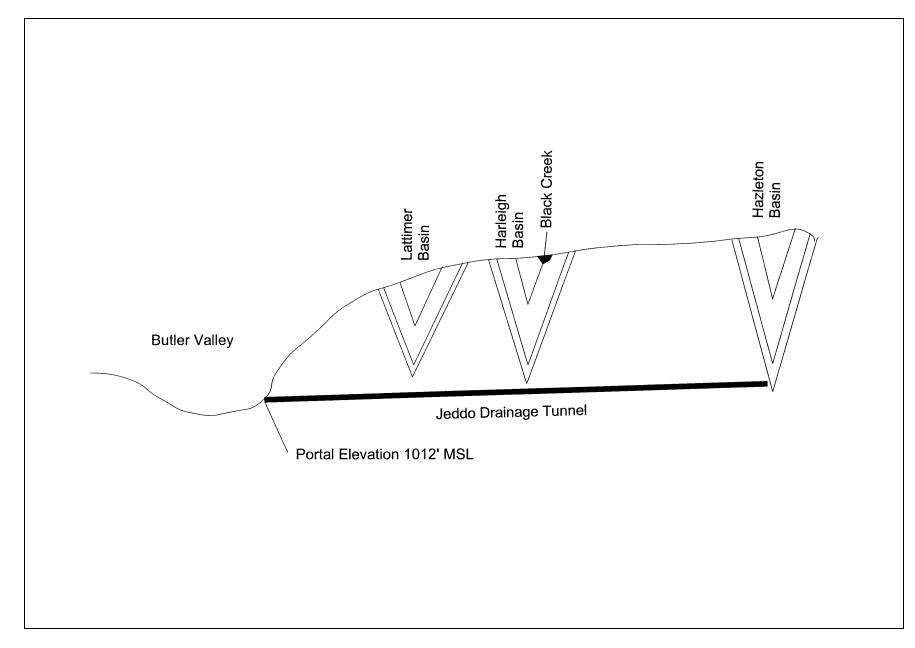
Schematic Cross Section of the Jeddo Tunnel (Anonymous, circa 1960)
